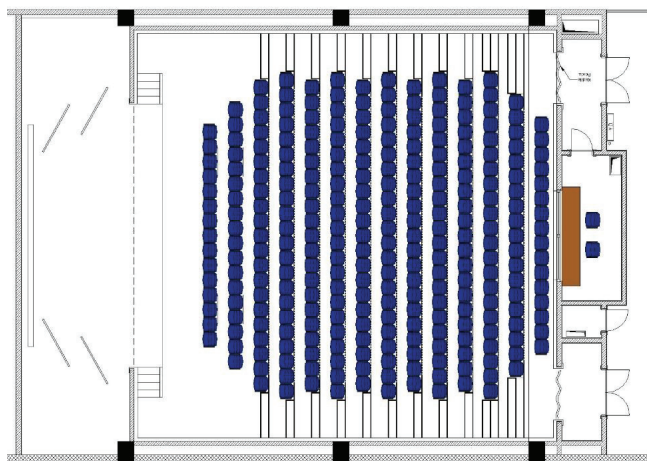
The schematic floor plan of TED high school multi-purpose lecture hall.
